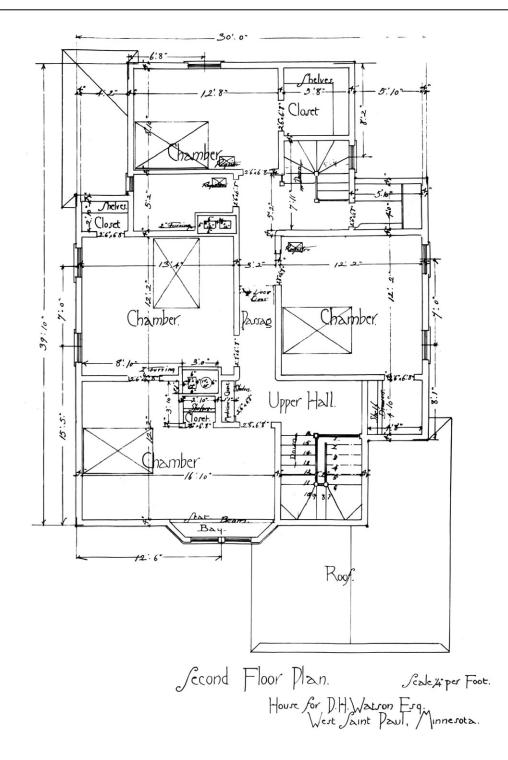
Second Floor Plan of Dwight and Clara Watson House Cass Gilbert Collection, New-York Historical Society
